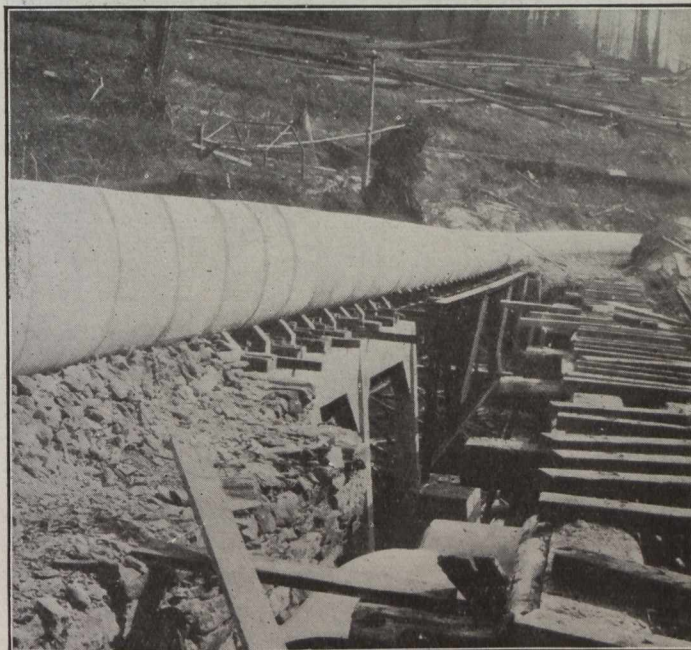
Concrete Pipe Line Crossing Sooke River with a Steel Bridge as Support.
